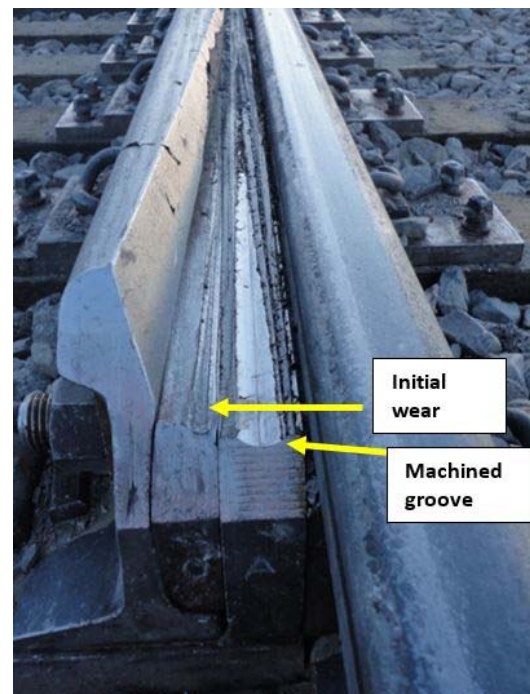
Non-centered Running on Flange Bearing Ramp (note wheel flange path)
